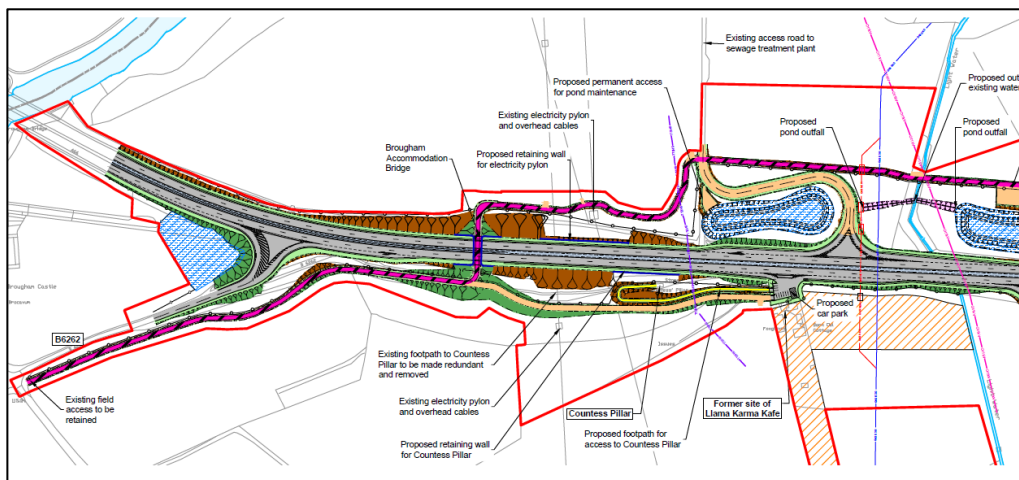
(b) Extract from General Arrangement Drawing (Before)
